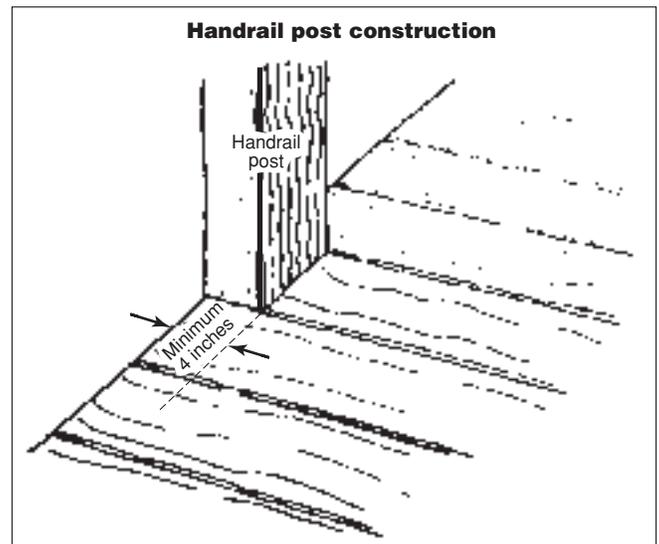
When the handrail post is attached to the stringer below the deck, the decking should extend at least 4 inches beyond the stringer.
